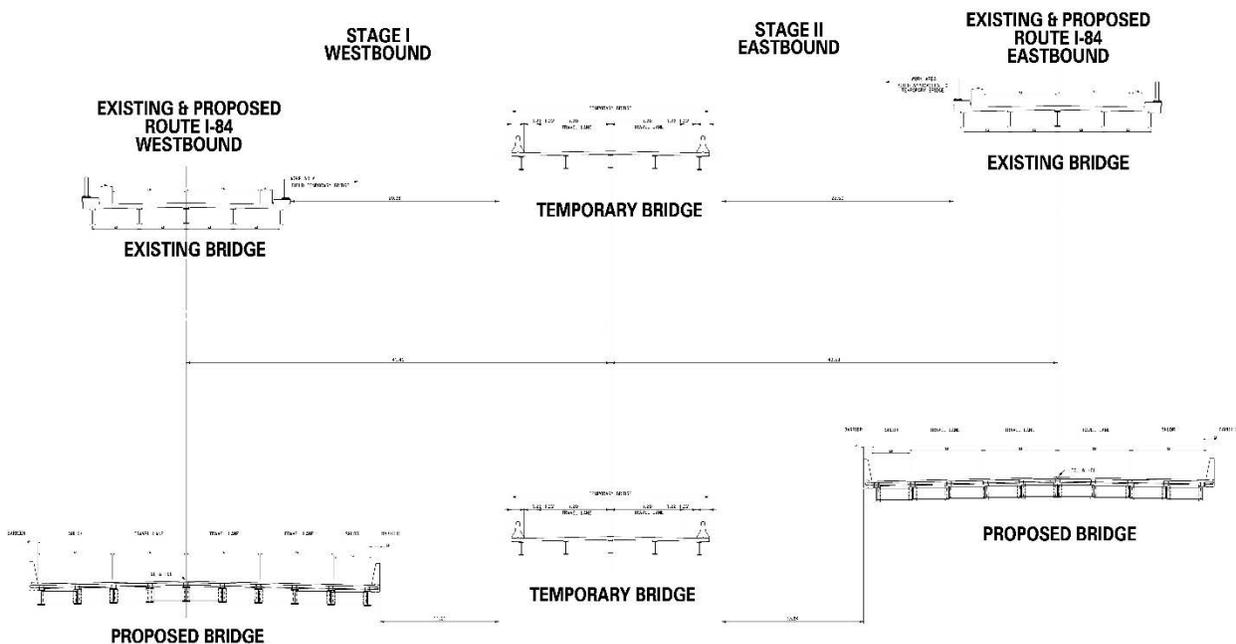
Diagram. Project staging as envisioned under traditional construction.
